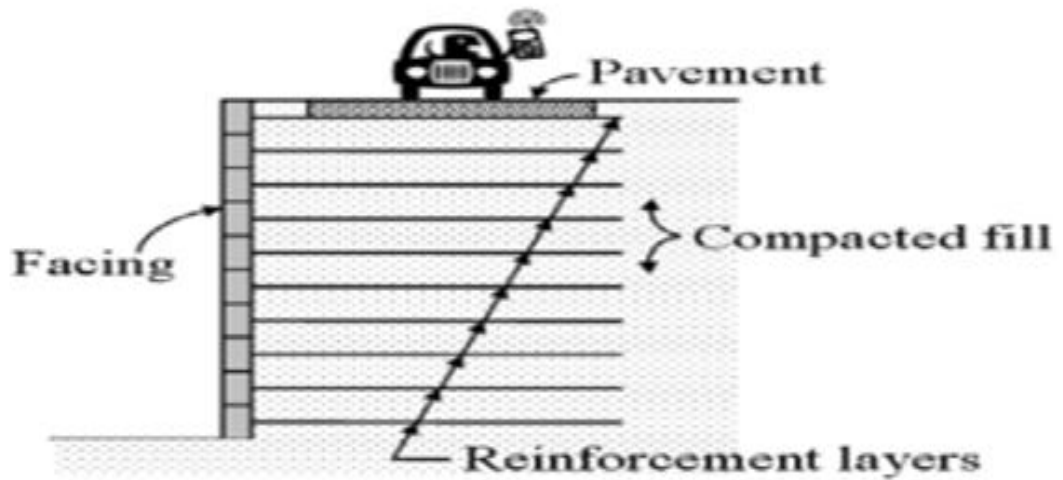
1 Soil Reinforcement Application on Retaining Walls (Guru Nanak 2012)
